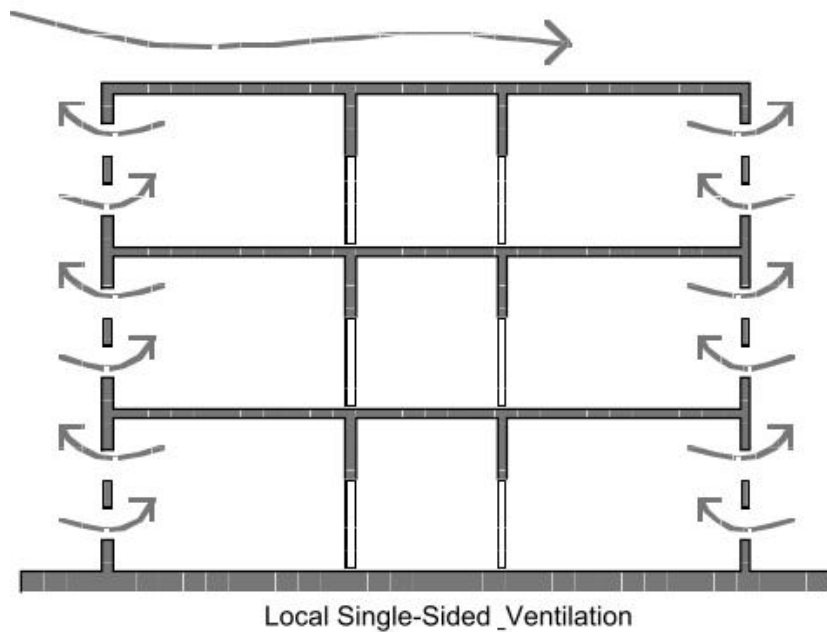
Showing Schematic of Single-Sided Ventilation in A Multi-Room Building
